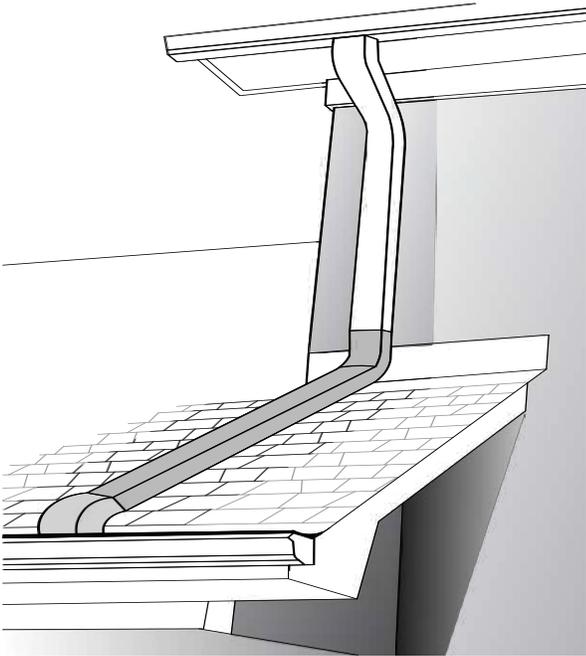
Channeling Runoff to a Gutter With a Downspout Extension
